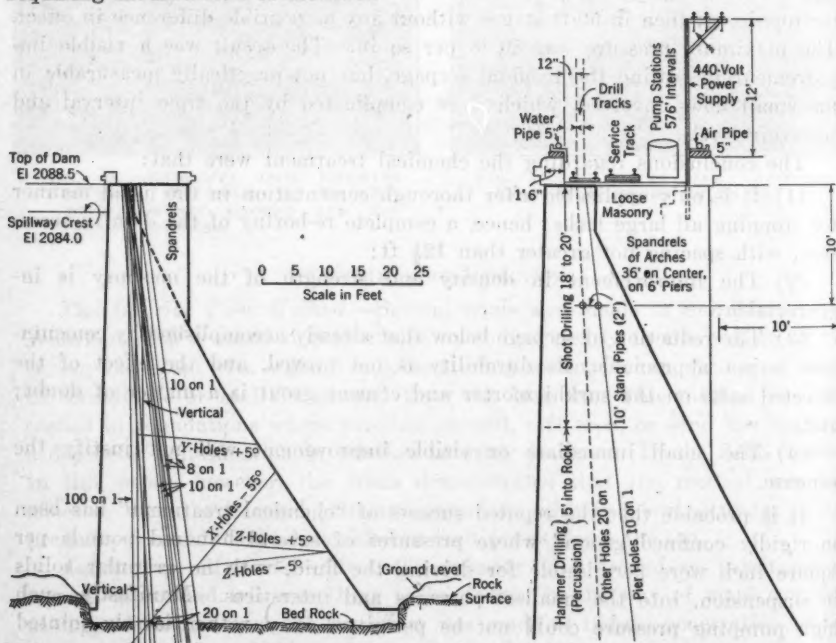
TYPICAL SECTION, WALWHAN DAM, SHOWING POSITION OF THE SEVERAL SERIES OF BORINGS.
